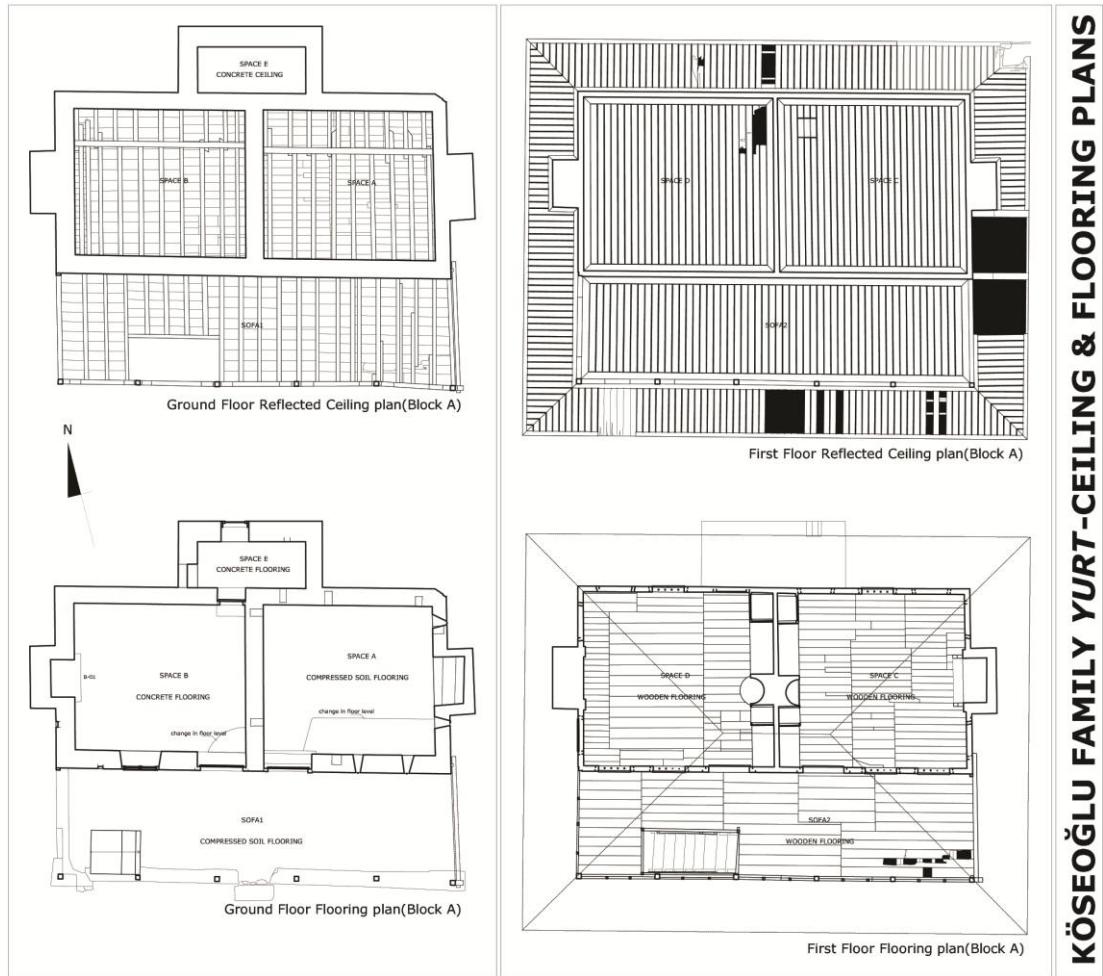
Flooring and reflected ceiling plans of Block A in the *yurt* of Köseoğlu Family
